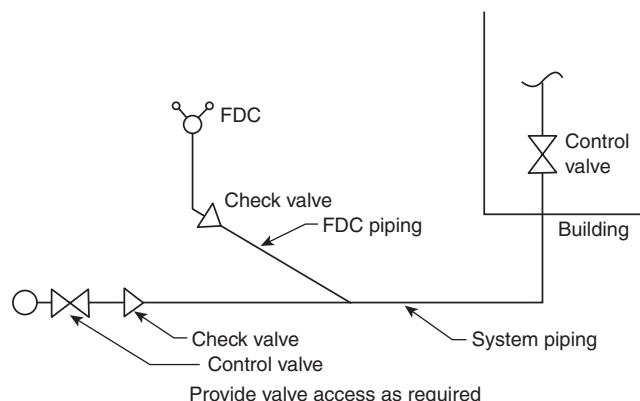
Fire Department Connection Connected to Underground Piping (Sample 1).
